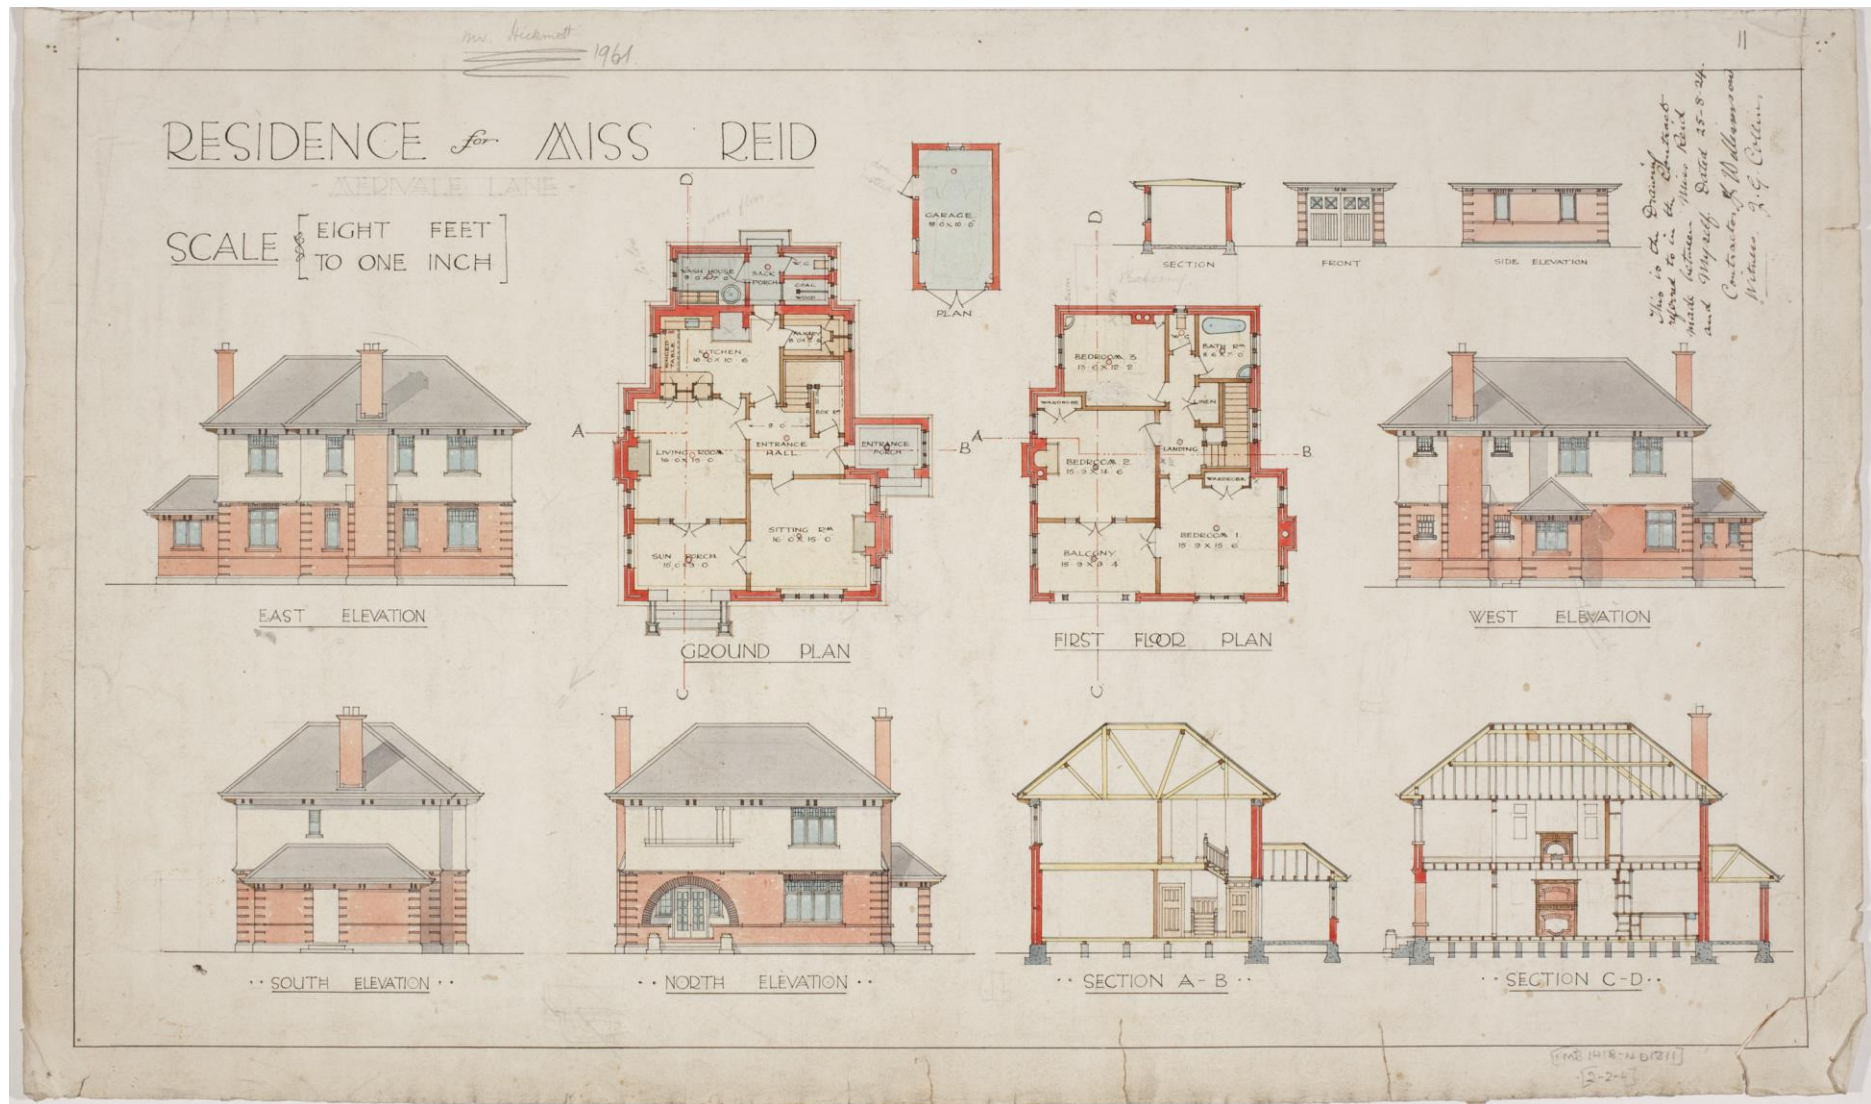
Collins and Harman, Residence for Miss Reid, Merivale Lane, plans, elevations and sections (1924).
